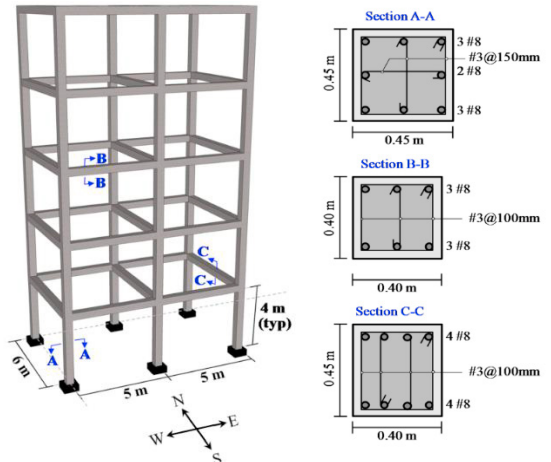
RC building frame: isometric view and beam and column cross-sections.
